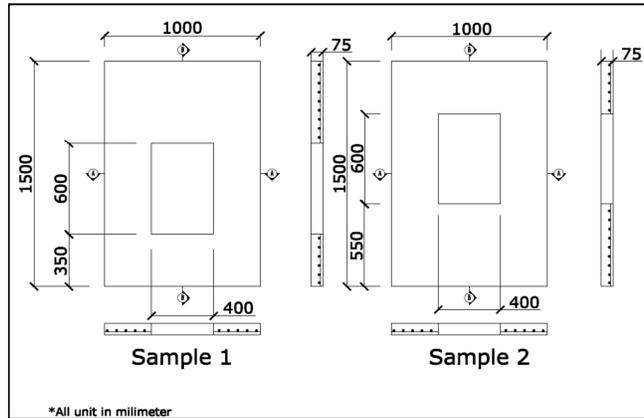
Details for reinforced EPS-LWC wall panel samples.
